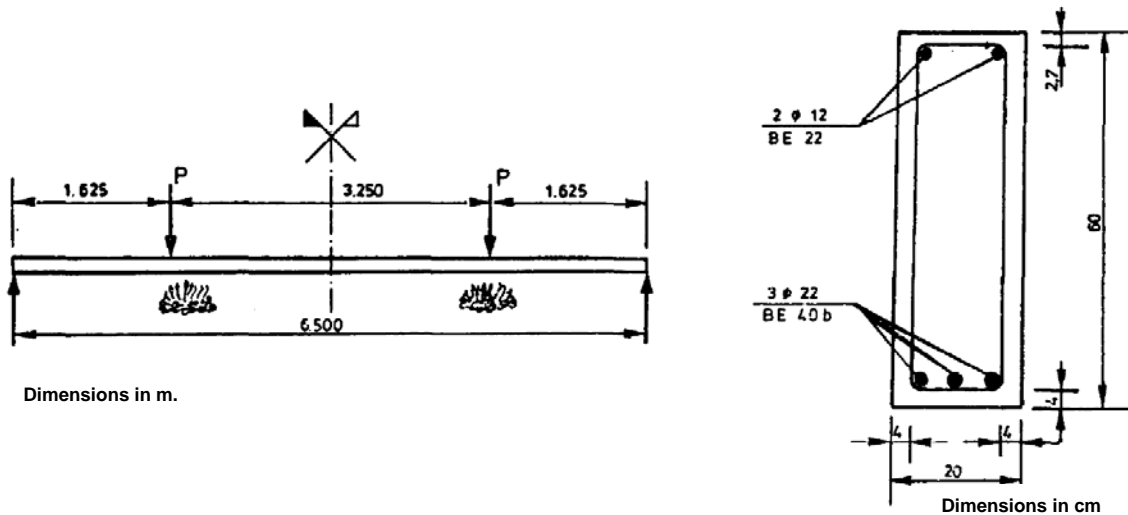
Loading and cross-section details of beams reported by Dotreppe [14]
